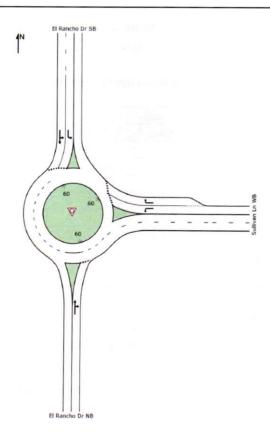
Proposed Roundabout Configuration – El Rancho Drive/Sullivan Lane
